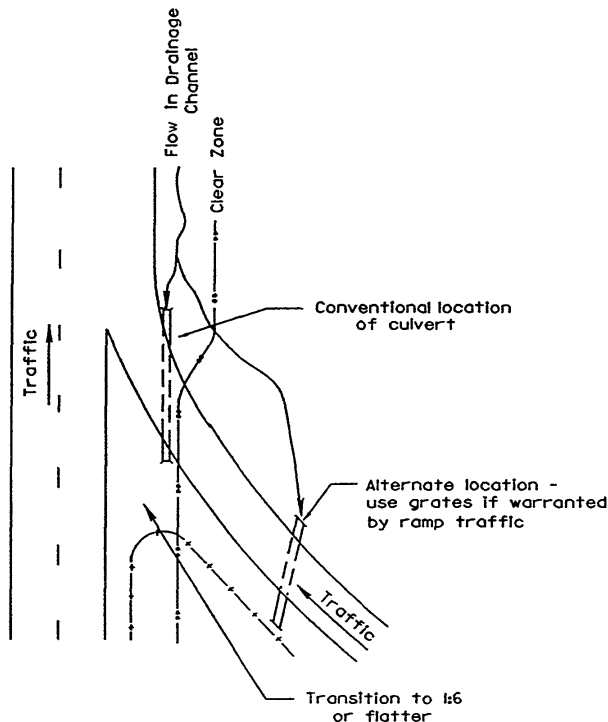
Alternate Location for a Parallel Drainage Culvert
